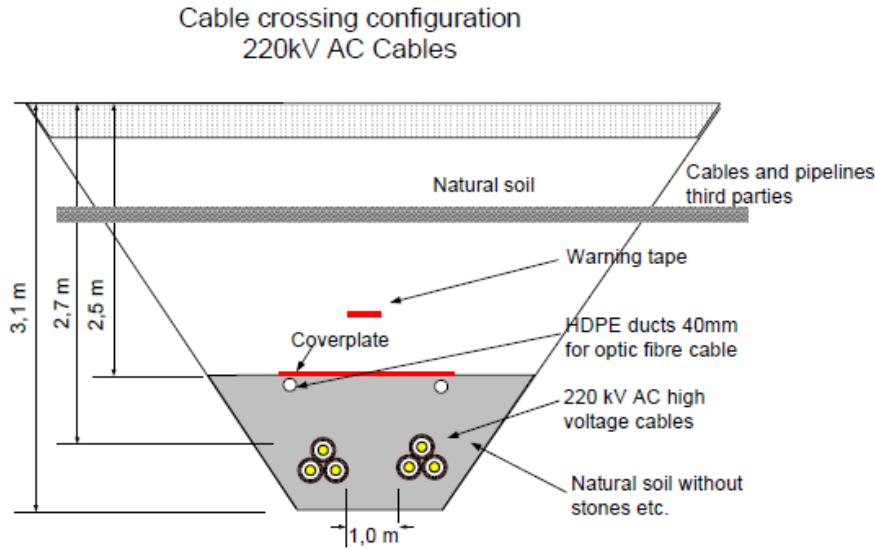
Cross view NorNed cable crossing HV cable trench Eemshaven
